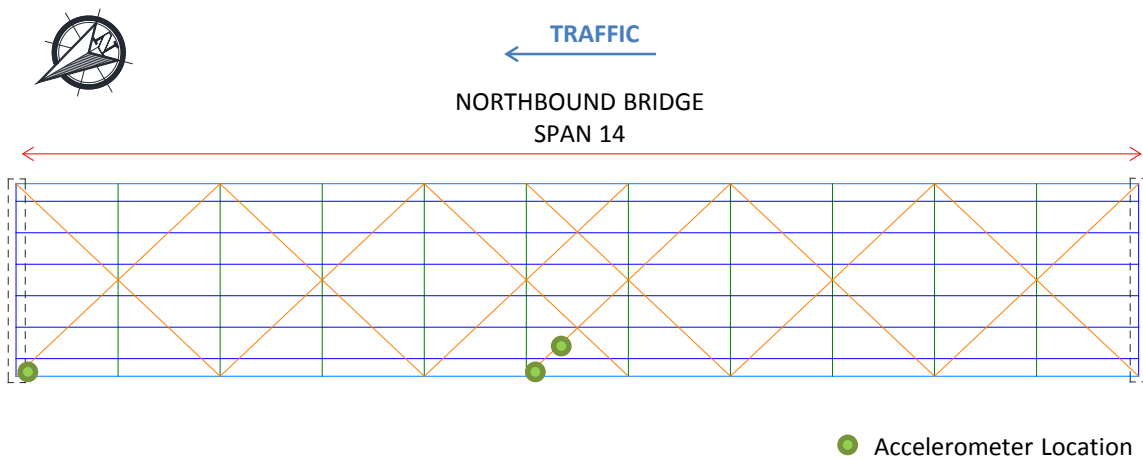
Plan view of the northbound I-5 Columbia River Bridge showing accelerometer locations.
